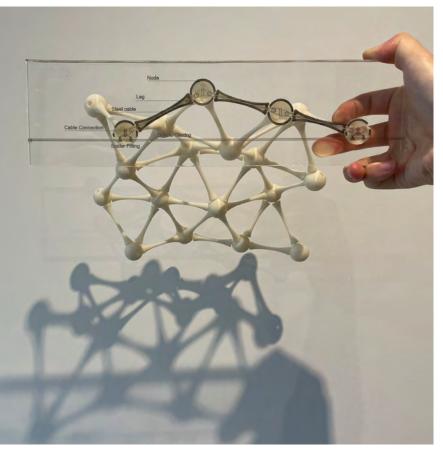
Envelop Prototype - Laser engraving, 3D Printing
